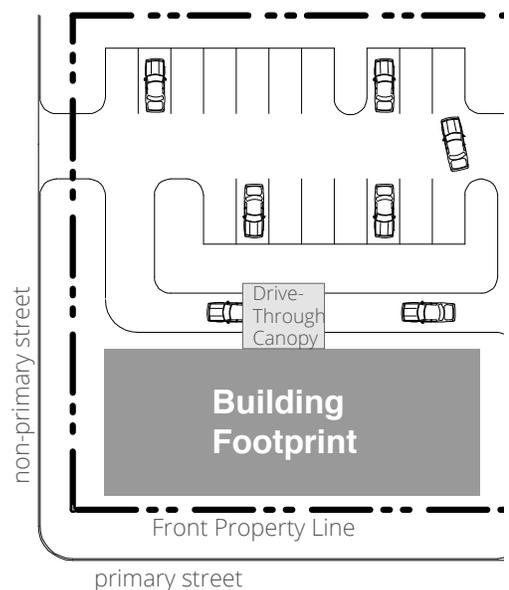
Recommended Drive-Through Facility Layout.
